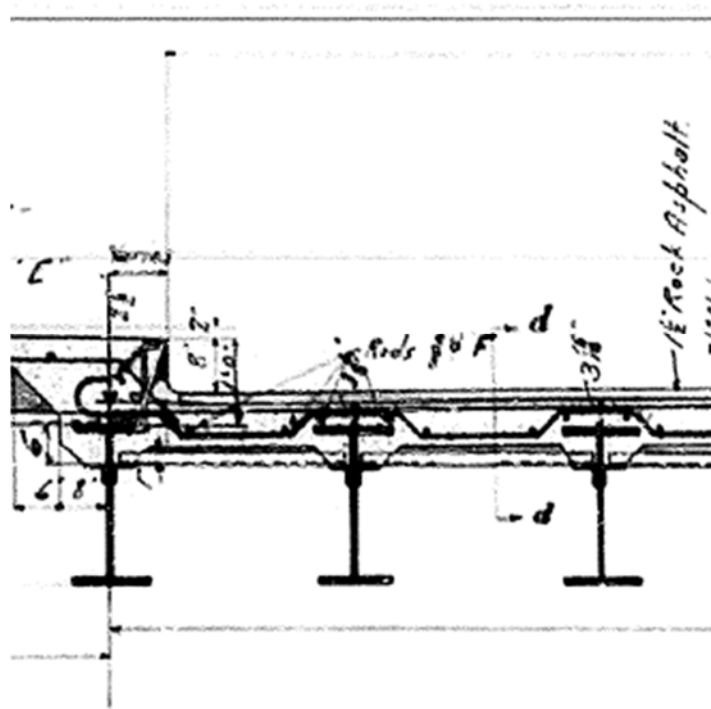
Structure 1516152 – Partially Encased Interior I Sections
